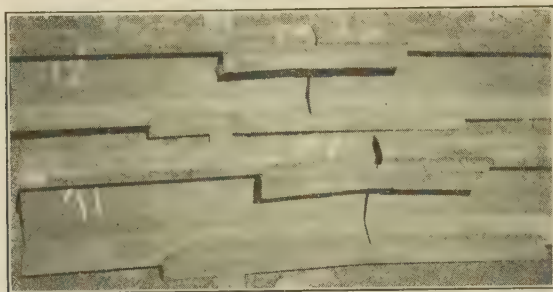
Base plate, head-bar joint on 7-in. T-rail tested upside down. No. 91, two $1\frac{1}{4} \times 1\frac{1}{4}$ in. head bars, weld broke at 90,750 lb. No. 92, one $1\frac{1}{4} \times 1\frac{1}{4}$ in. head-bar, weld broke at 52,150 lb.
